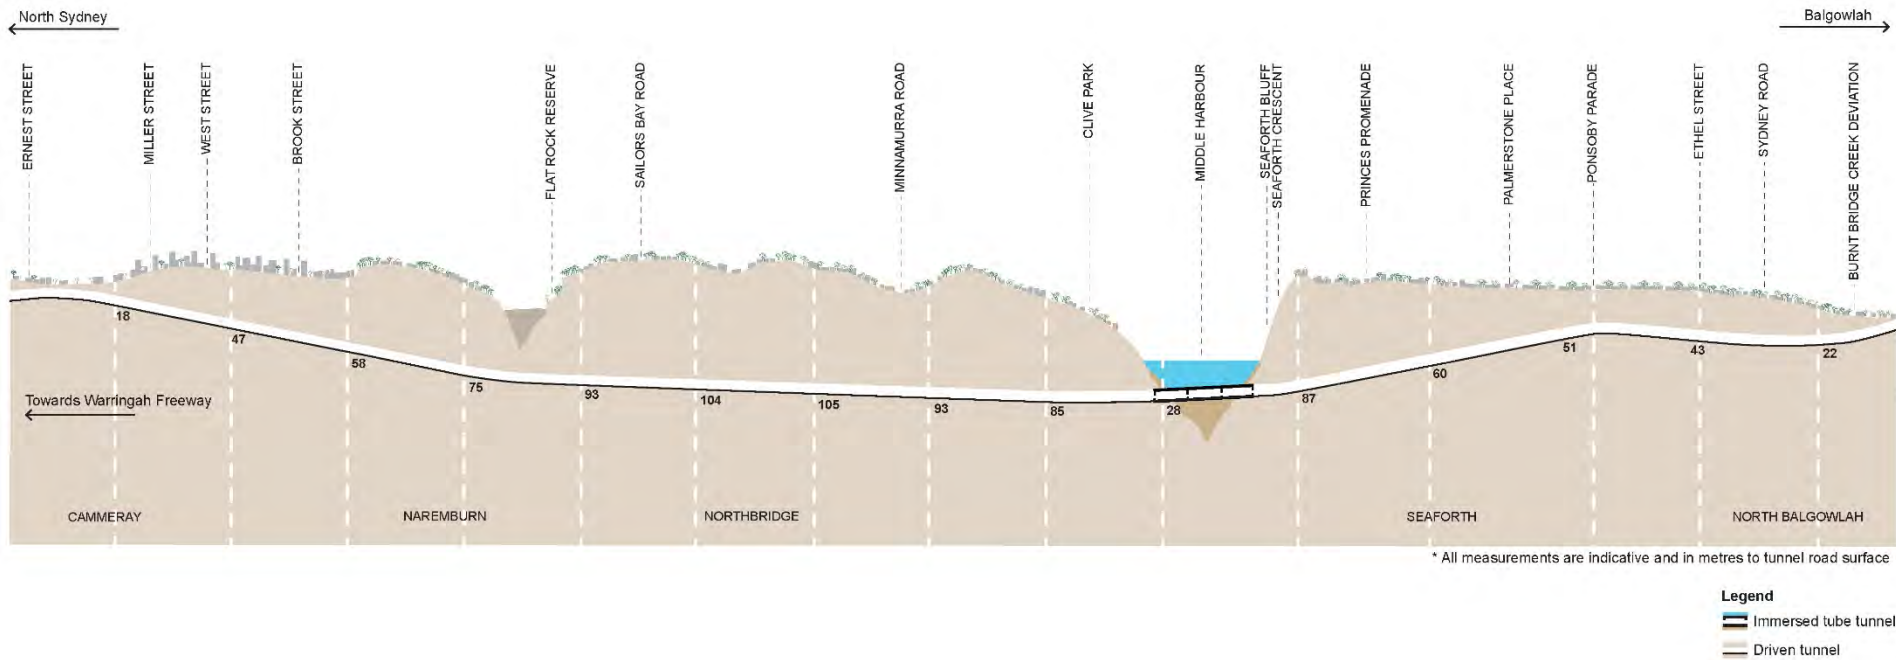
Indicative vertical alignment of the mainline tunnels and the ramp tunnel connection to the Burnt Bridge Creek Deviation (Cammeray to Balgowlah)
